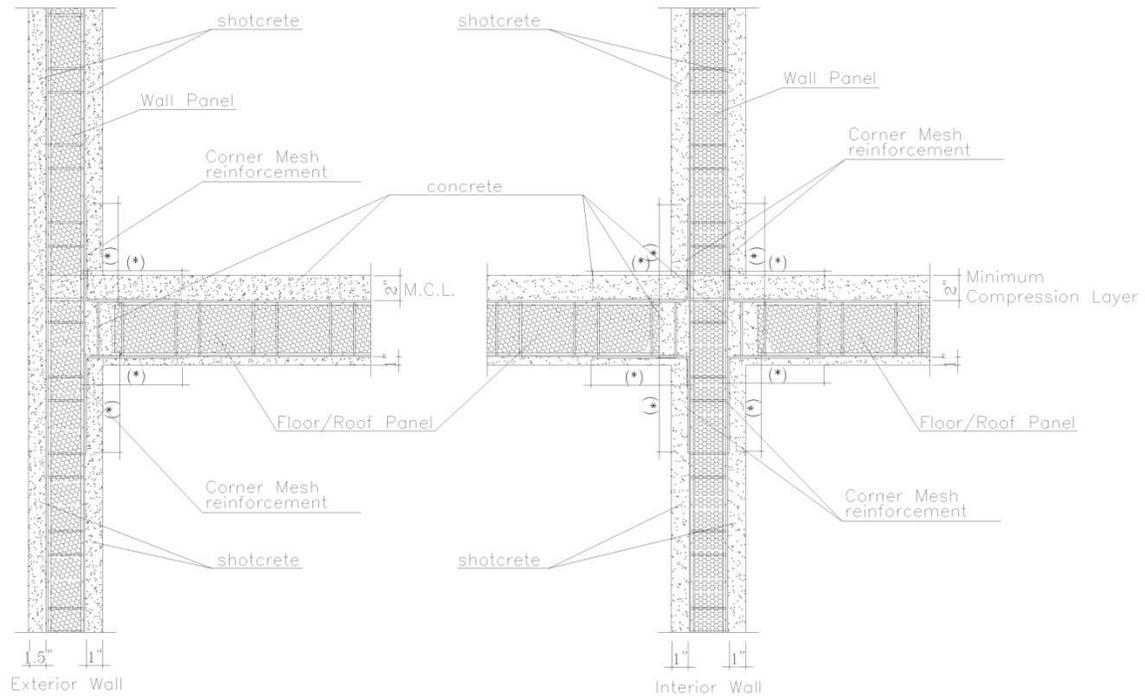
TYPICAL EXTERIOR WALL PANEL TO FLOOR/ROOF PANEL MESH DETAIL
